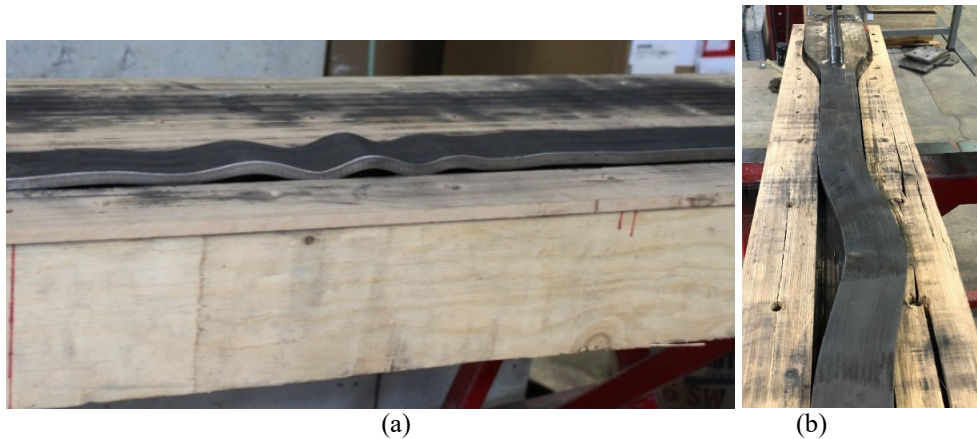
Failure modes: (a) specimen 4; (b) specimen 6
